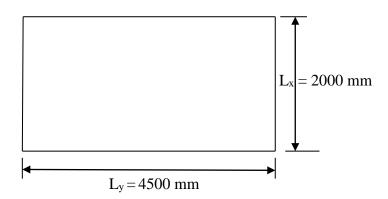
Interior solid reinforced concrete floor slab panel
